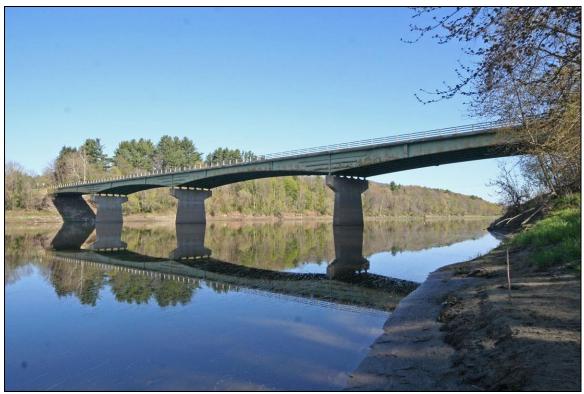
Present Ascutney Bridge, four span continuous welded plate girder built 1969 (Historic Documentation Company Inc. 2013).
